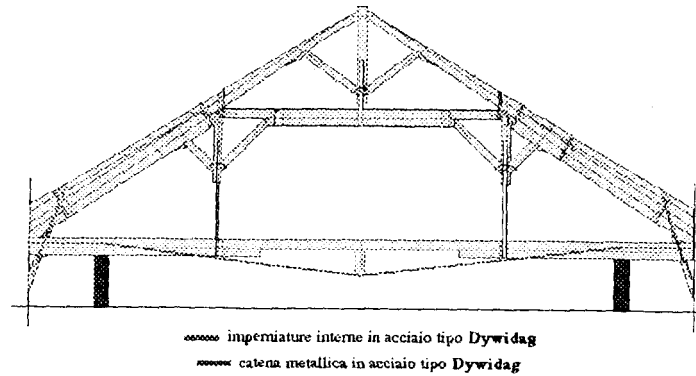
Roof trusses: - tie-beams reinforced with pre-stressed Dywidag cables
